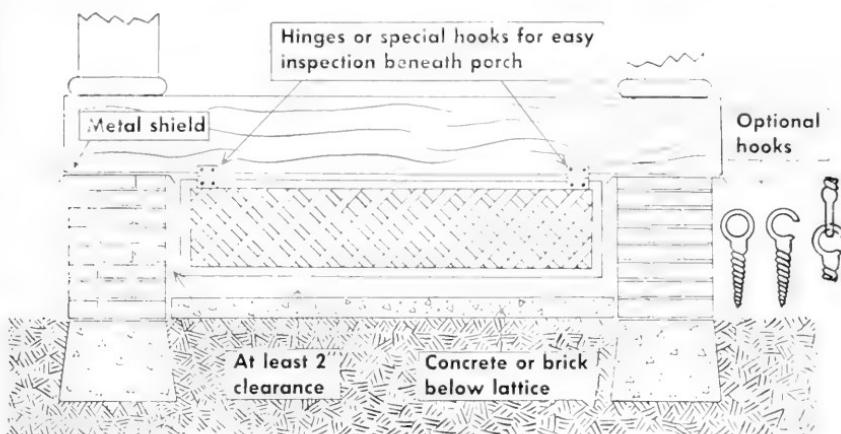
Recommended method of attaching porch lattice, which should be hung from hinges or hooks to facilitate frequent inspection of the foundation walls and porch supports. Hooks shown will allow easy removal of lattice. A clearance of 2 inches at sides and bottom will prevent entry of termites from soil or piers; piers should be capped with shields.
